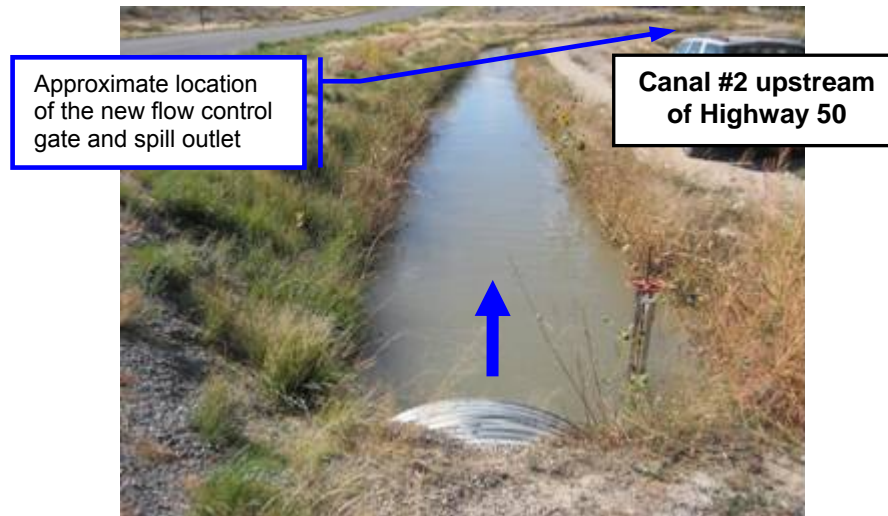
Canal #2 at the Highway 50 crossing. The new flow control gate will be installed in this section of canal and a pipeline will connect to the existing alignment of the Wrecking Yard drain channel.
